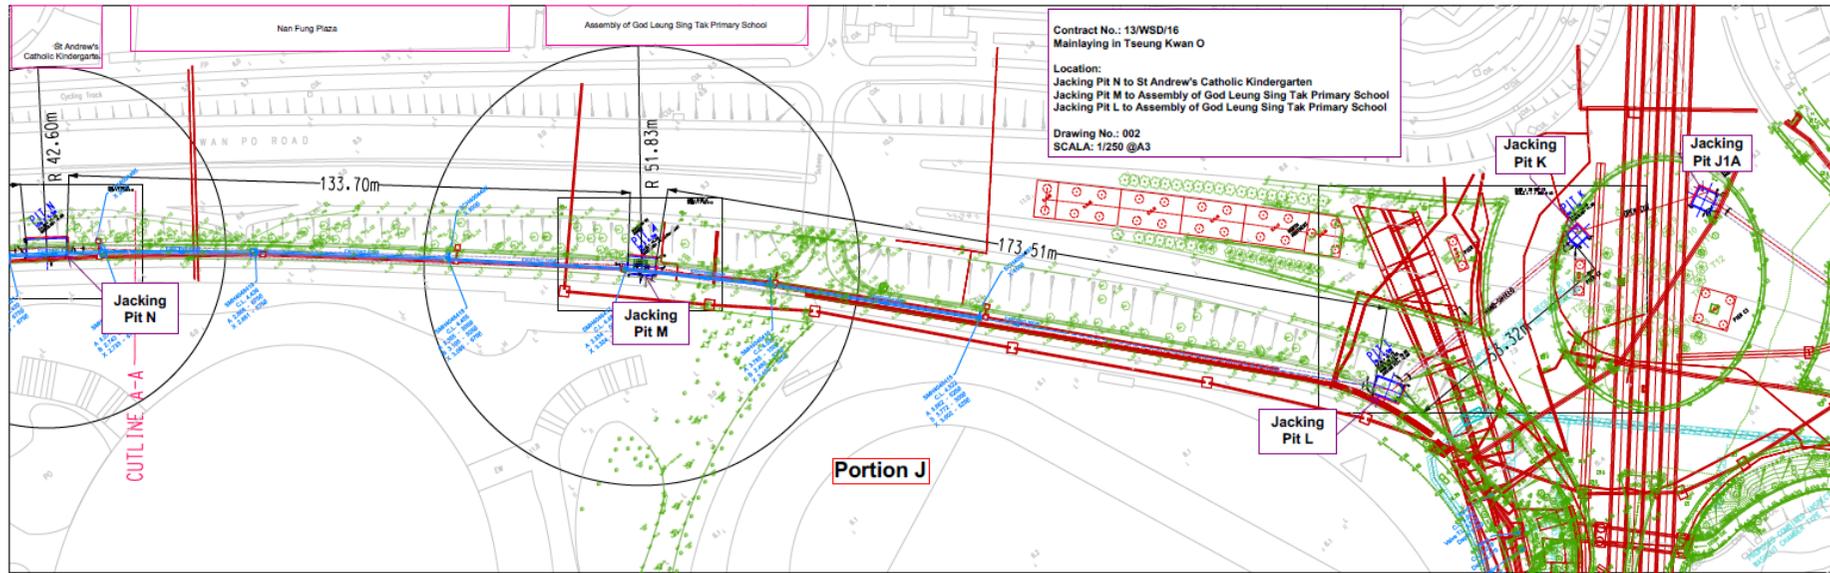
Location Plan for Portion J – Pit L-M-N, K, J1A
